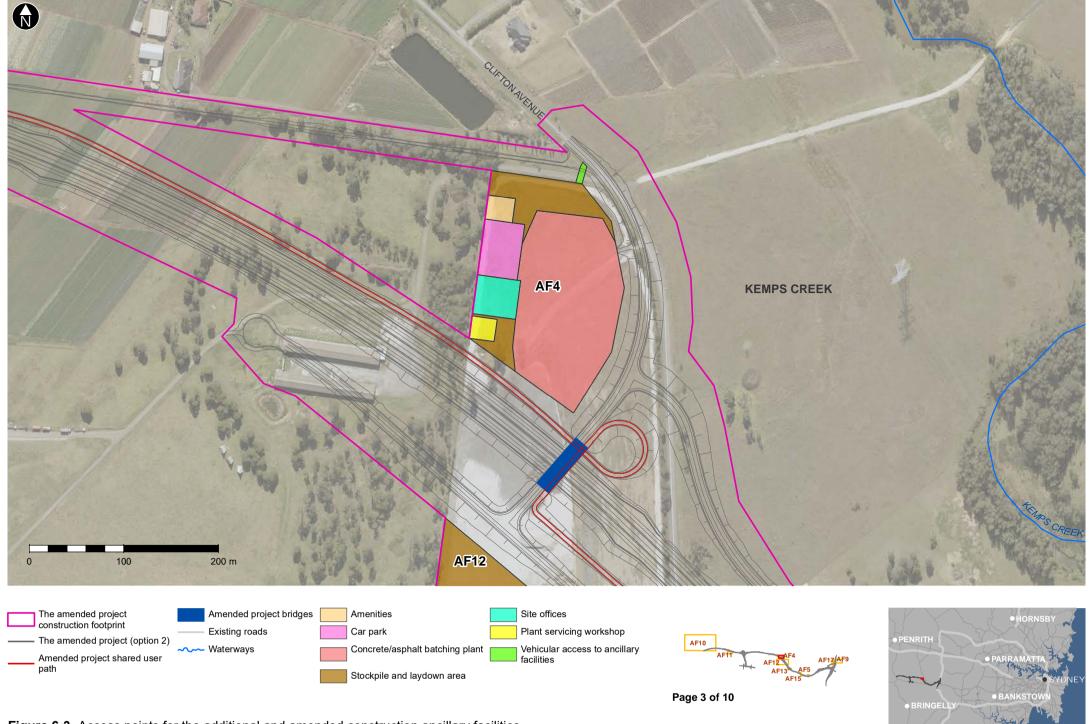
Access points for the additional and amended construction ancillary facilities
